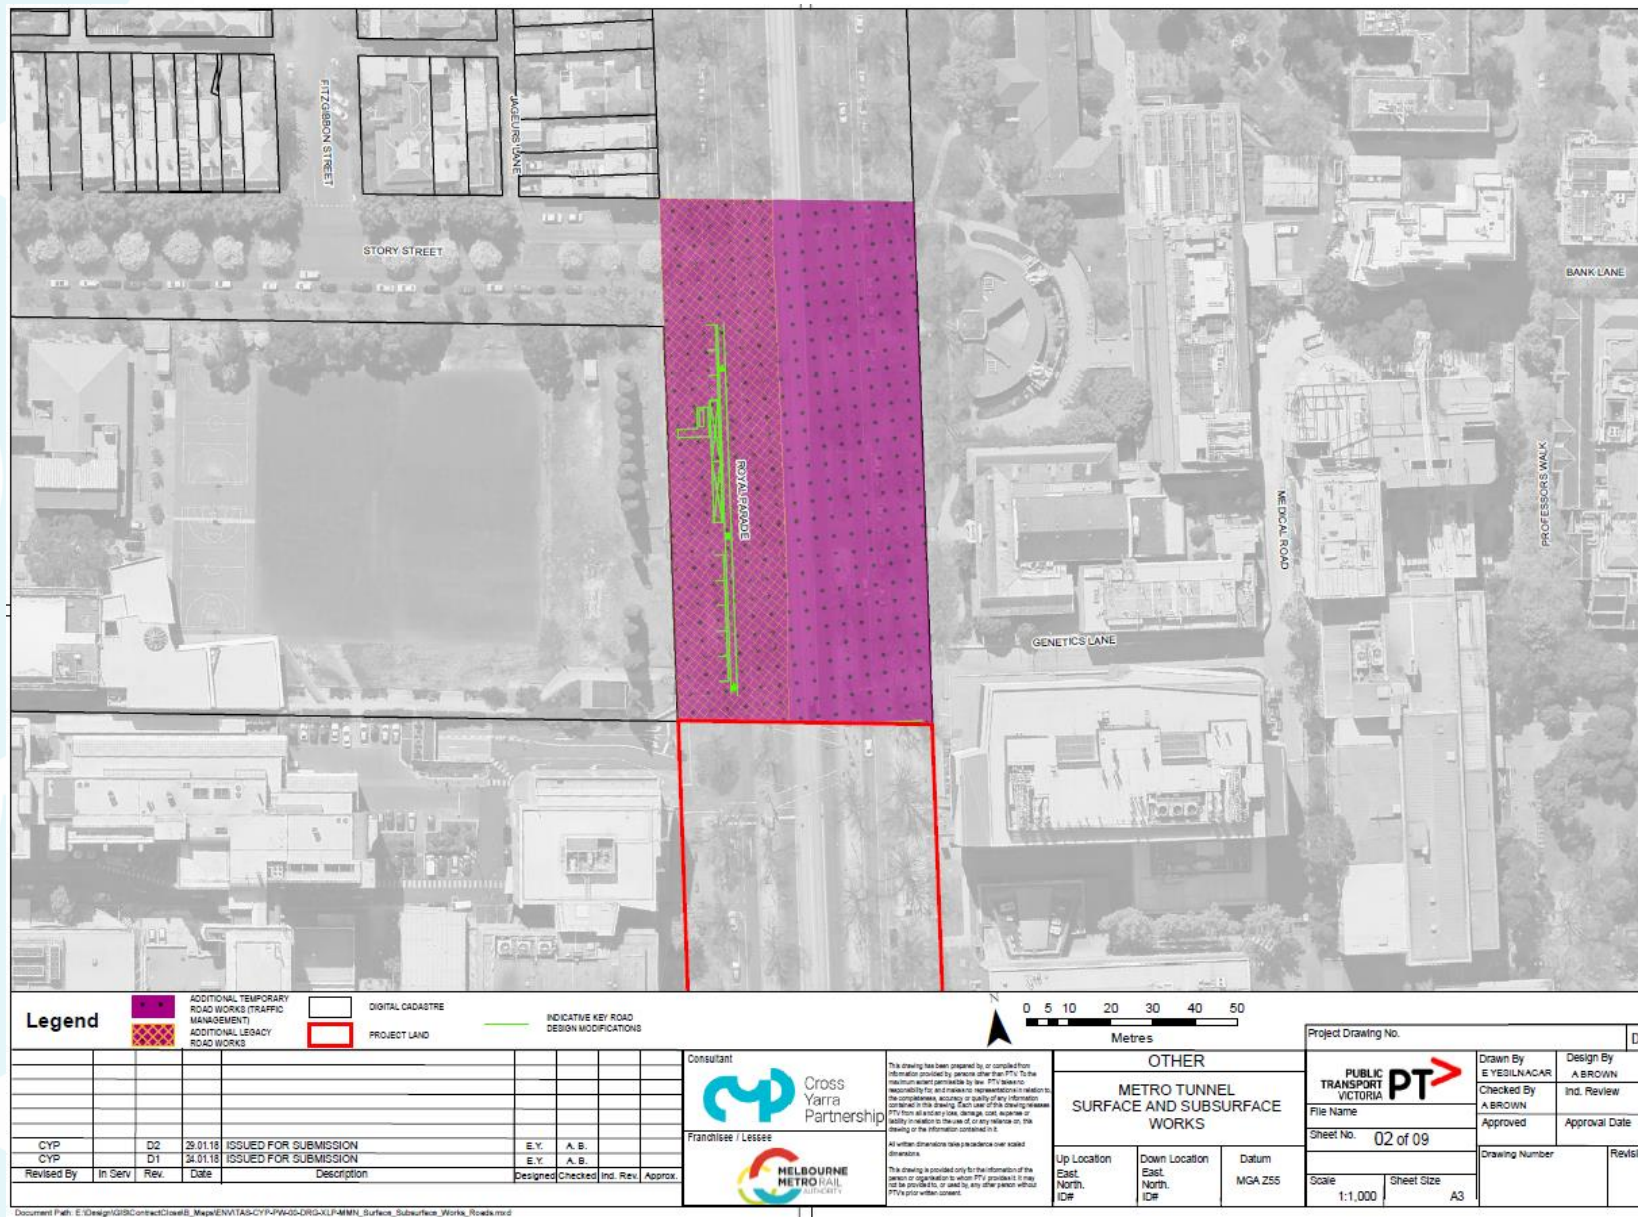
ROYAL PARADE ADDITIONAL ROAD SURFACE WORKS
